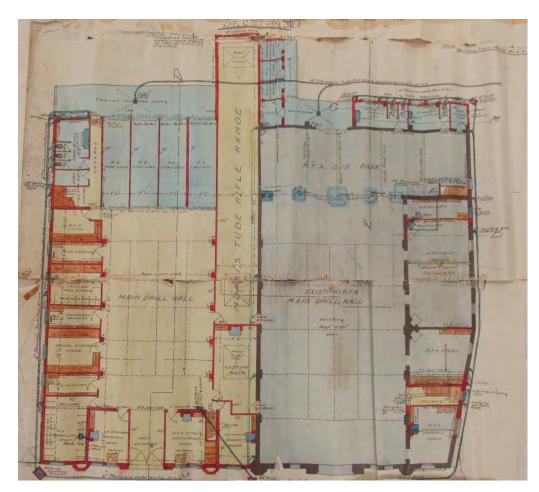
Plans of the new and existing ( East Sussex Record Office)
